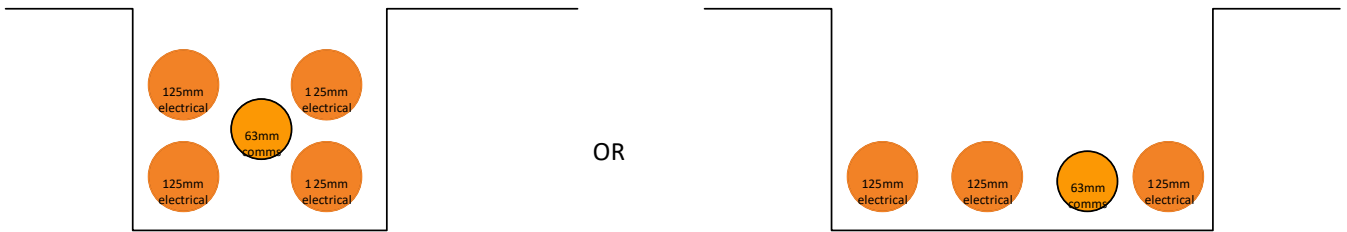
TYPICAL CONDUIT INSTALLATION DETAILS
